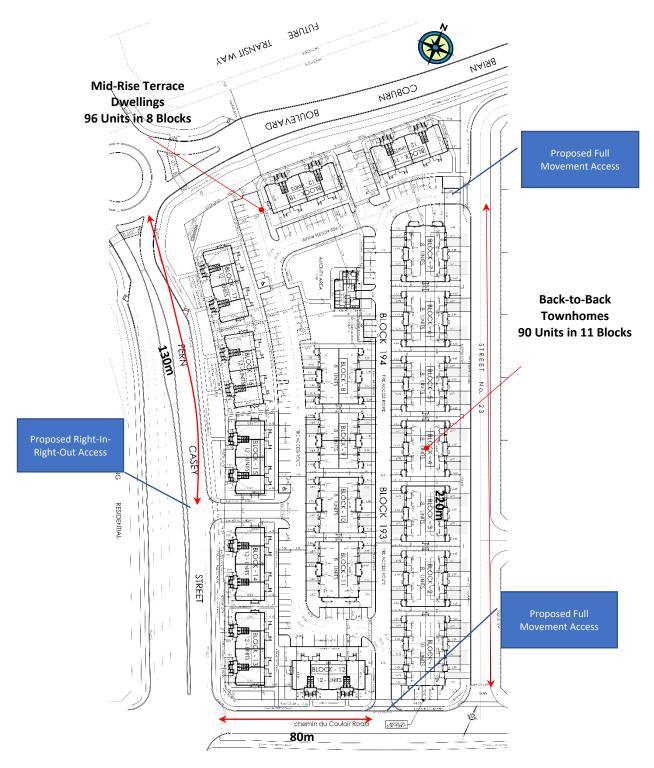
Site Plan of Proposed Development (Nov. 2020)
